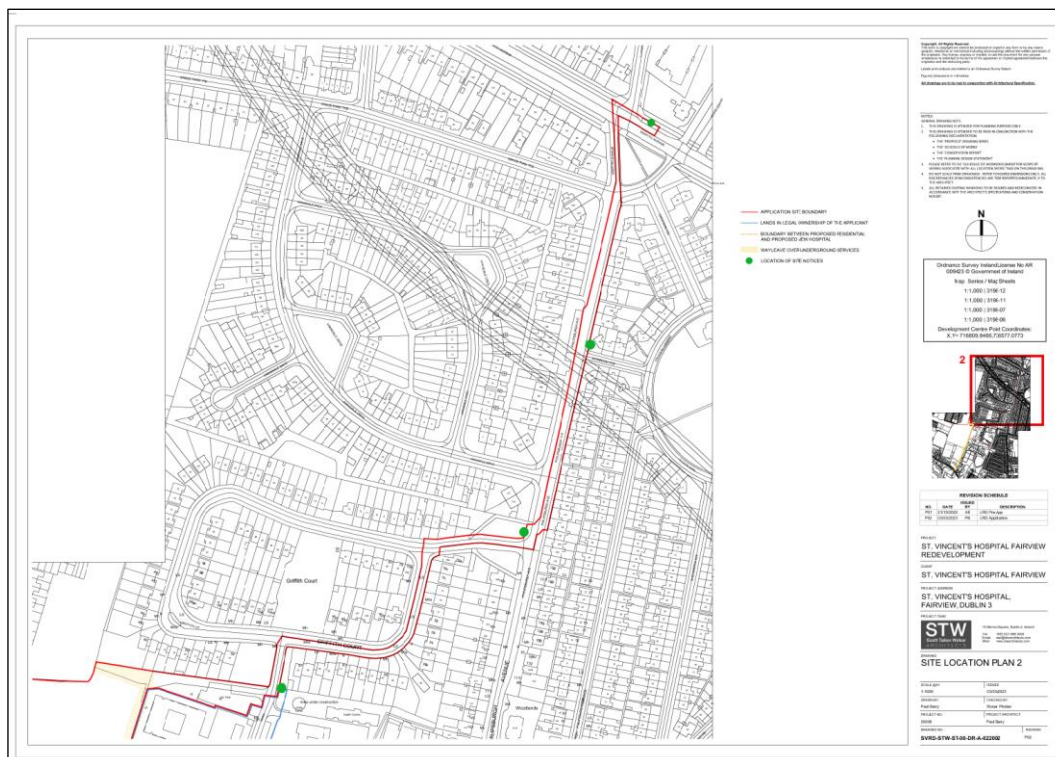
Proposed Water Mains Connection (Source STW Drawing No. SVRD-STW-ST-00-DR-A-022002)
